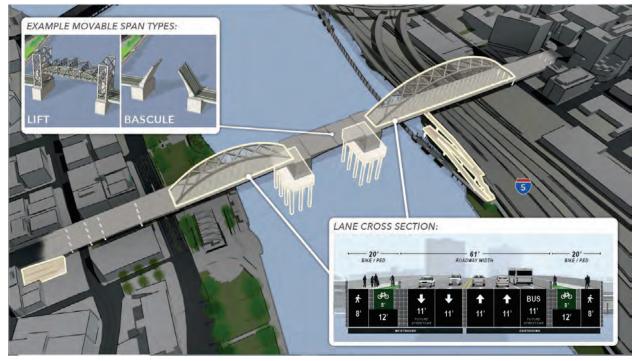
shows the Draft EIS Long-span Alternative highlighting those elements that would be revised with the Refined Long-span Alternative including a narrower bridge and cross section, the bridge piers, the west span bridge type, and the east span length. Figure 2 highlights the elements of the Refined Long-span Alternative that are different from the Draft EIS Long-span Alternative. Figure 3 shows the DEIS Long-span cross-section (with 5 vehicle lanes and 40 feet of the bridge width dedicated to bicycles and pedestrians). Figure 4 shows the Refined Long-span cross-section options (all of this have 4 vehicle lanes and 32 feet for the bridge width dedicated to bicycles and pedestrians).
